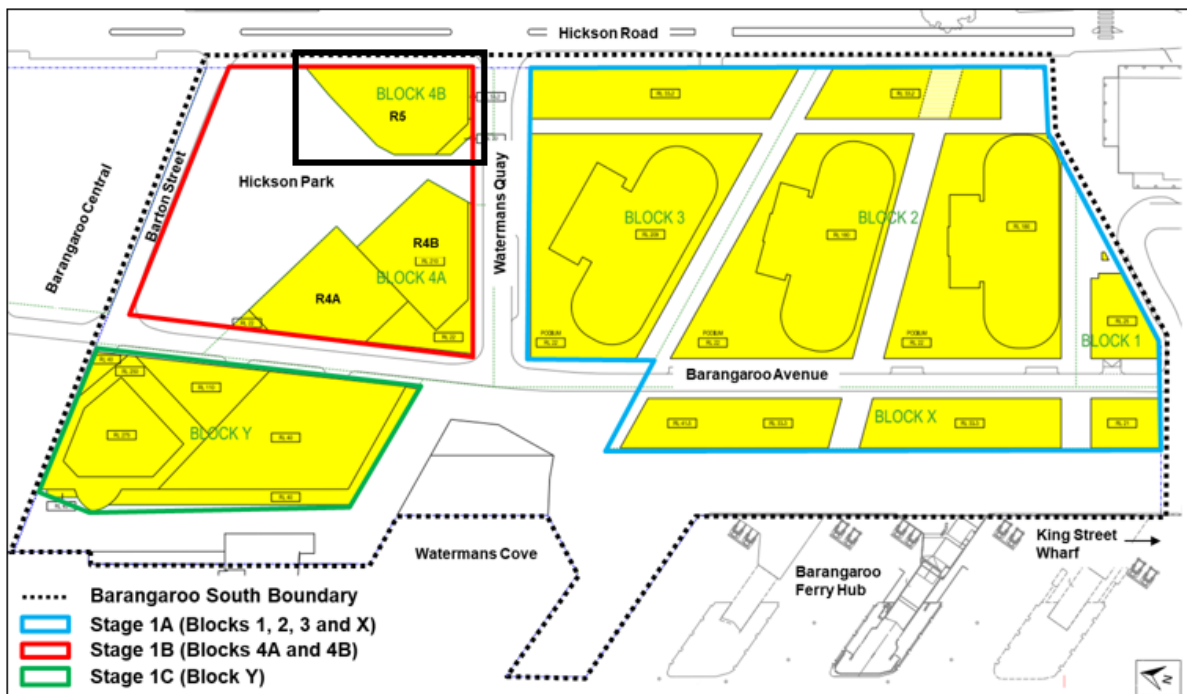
| The location of Building R5 within Block 4B in Barangaroo South layout (Source: MP06_0162 MOD8)
